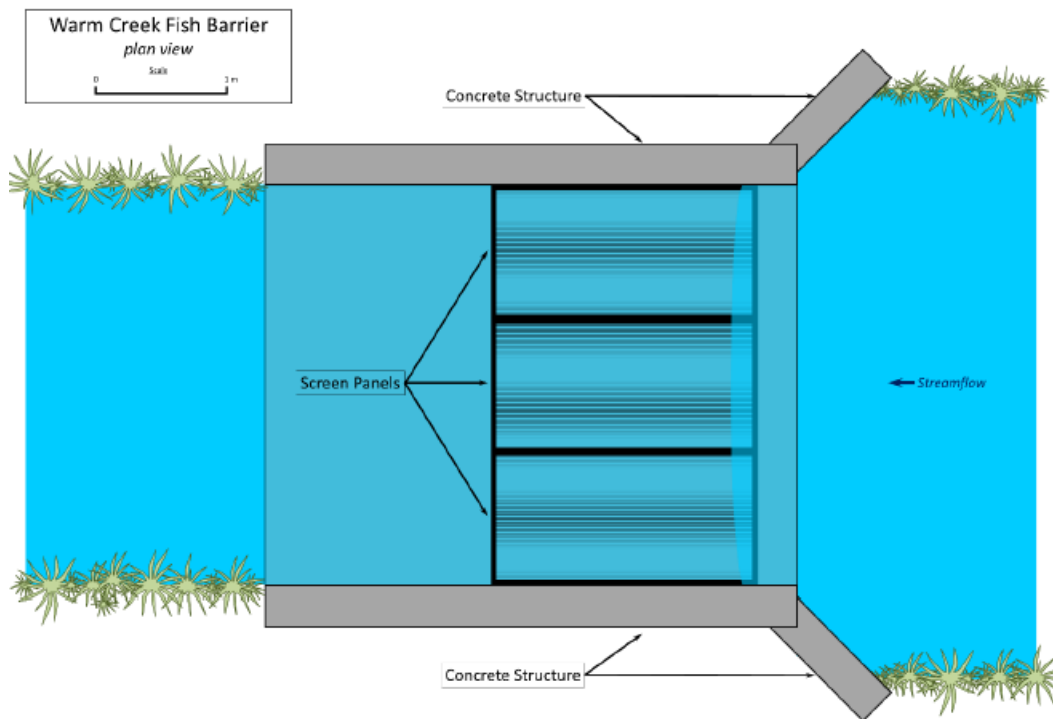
Warm Creek barrier design – plan view. The barrier could undergo some modifications in design during construction.
